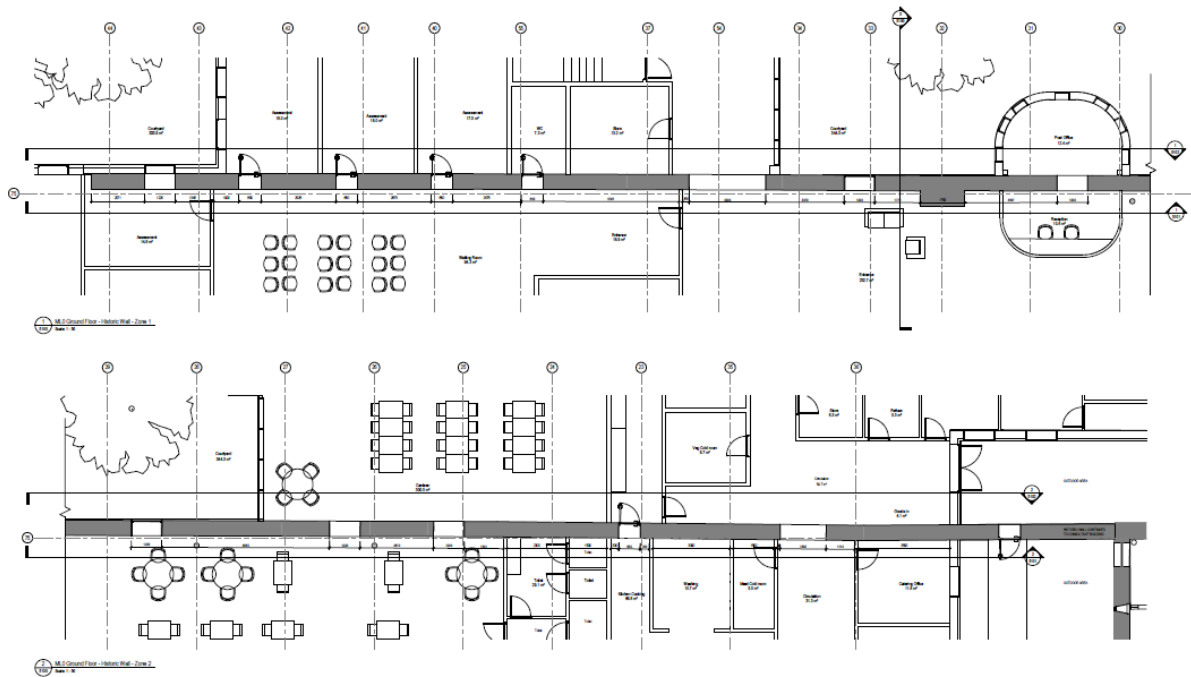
Proposed ground floor plan. Above: Part 1. Bottom: Part 2. Source: TOT Architects
